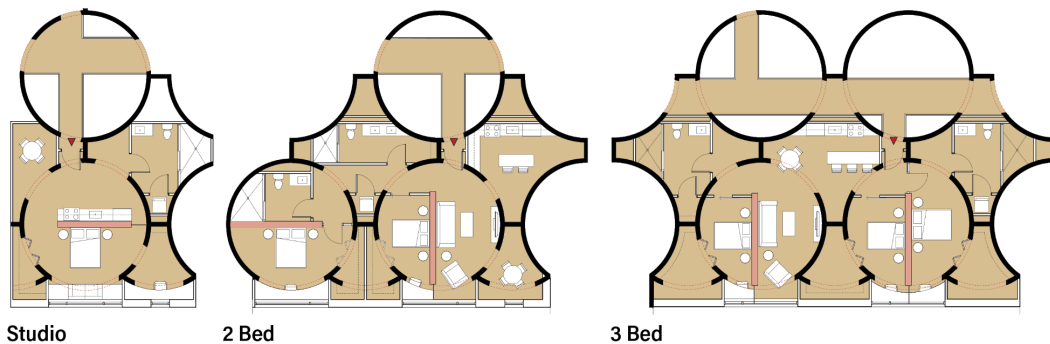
Studio, 2 Bedroom, and 3 Bedroom examples of apartment floor plans utilizing the parti strategy. Image Credit: Author
